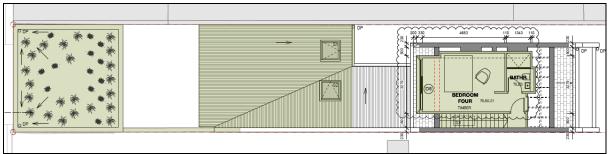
Approved Second Floor Plan - No.94 Douglas Street, Stanmore
